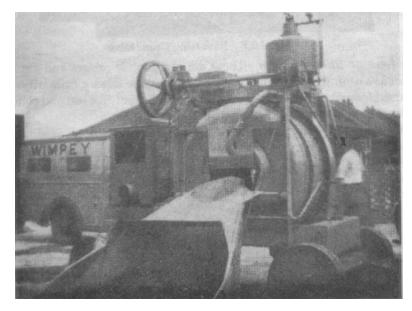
Non-tilting Drum Type Concrete Mixer, Provided with a Vertical Water Measuring Tank
